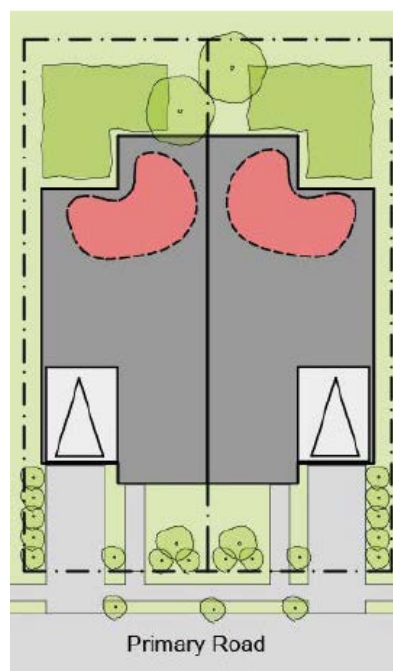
Dual occupancies are permitted to have individual driveway access on a 6m wide lot
